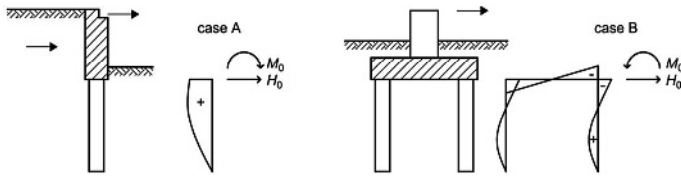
Types of horizontal loads on structural piles, after [6]
